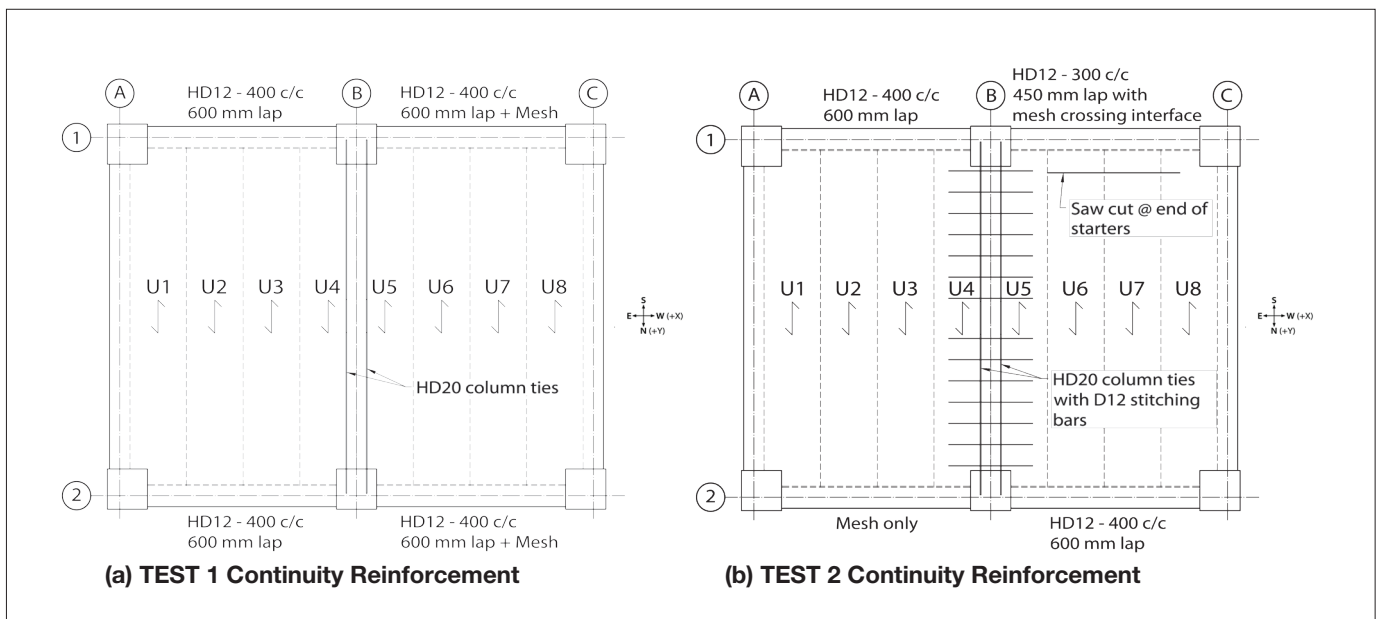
Floor continuity reinforcement arrangements for TEST 1 and TEST 2 (Büker et al. 2022)
